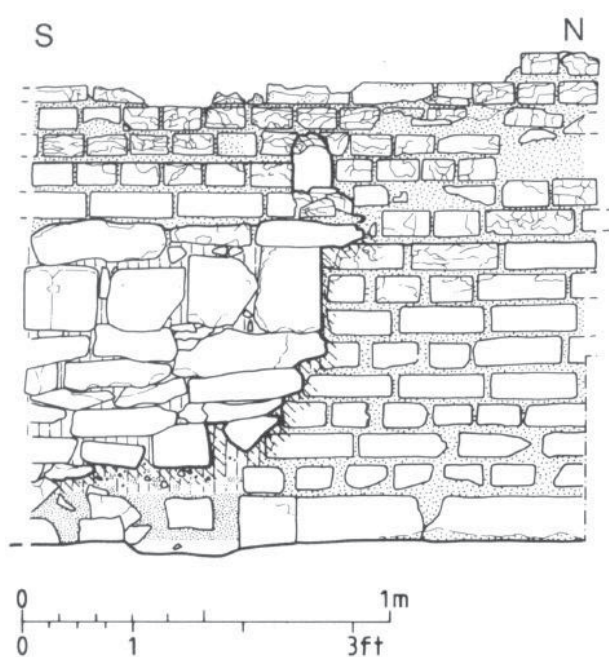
The Great Garden, Kirby Hall: change of foundation in the brick wall of the West Terrace
